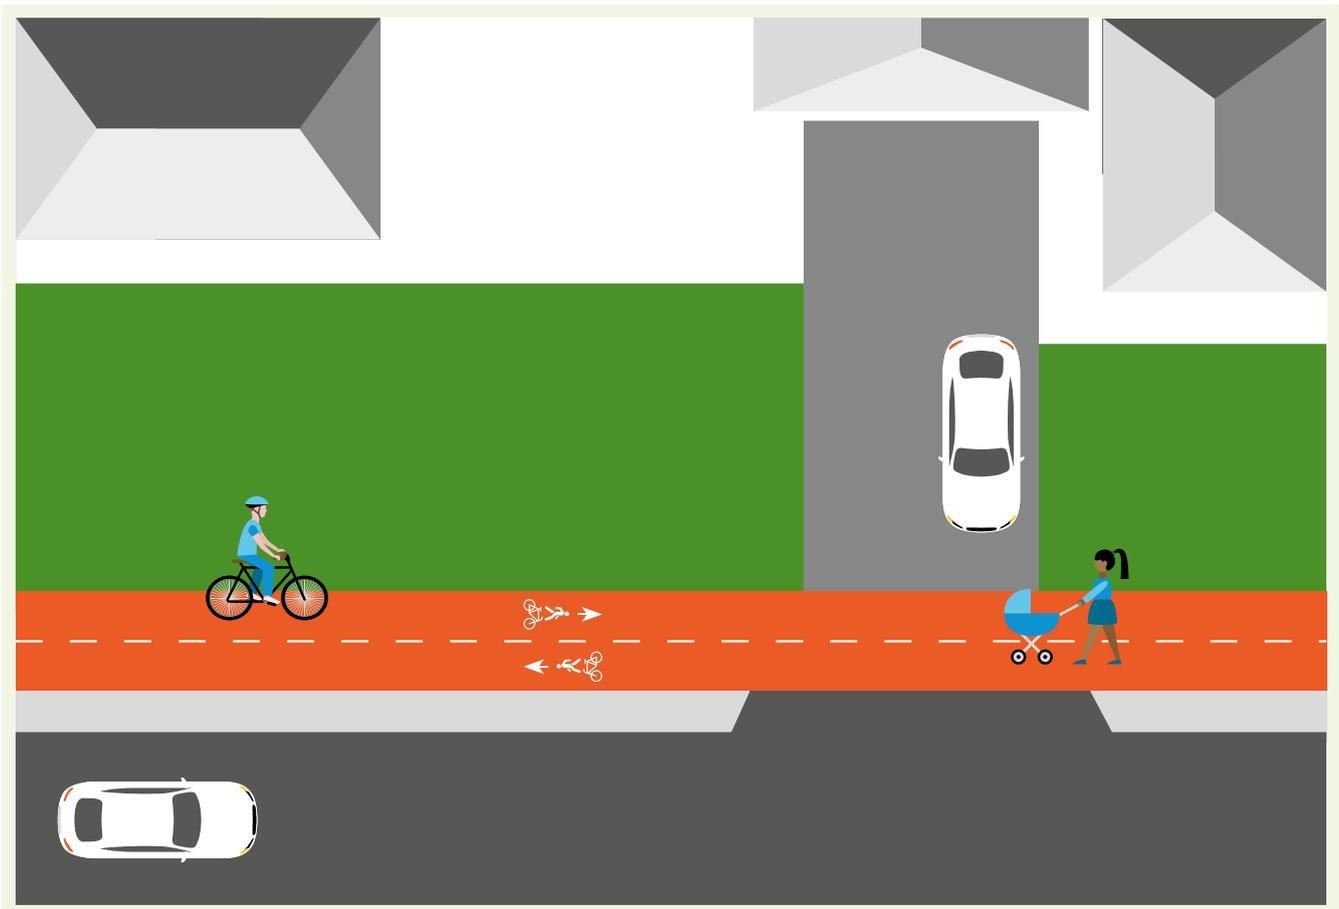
Intersection type 1 (non-indented, priority) – suitable only for driveways.
